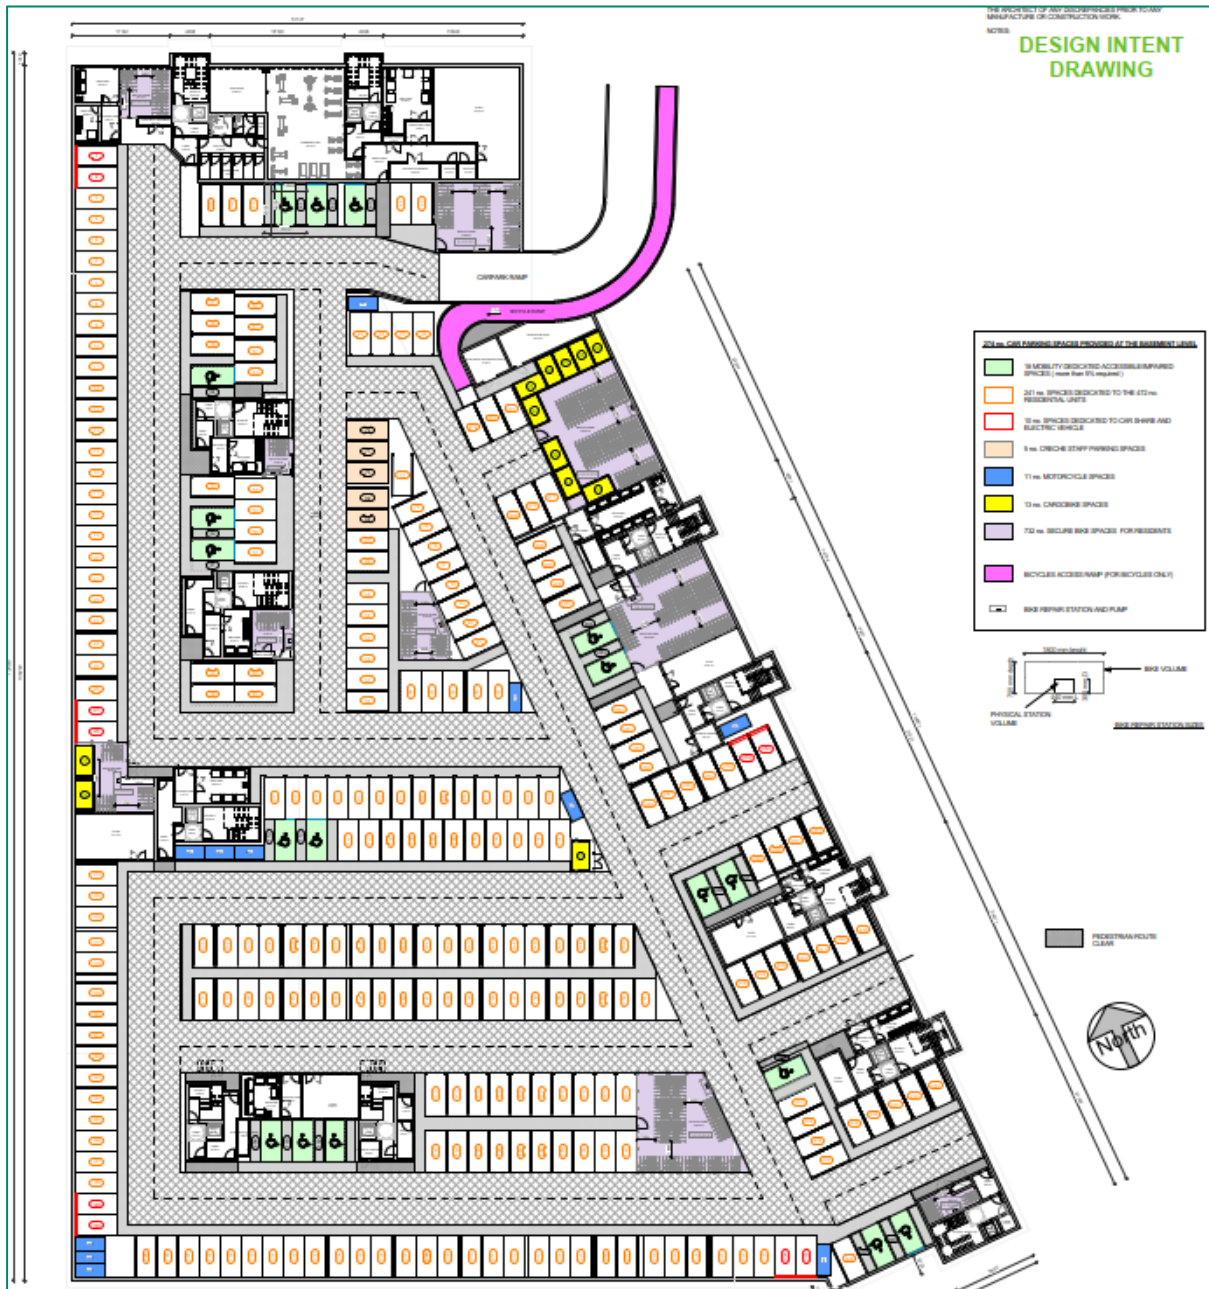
Basement Layout (Source: C+W O'Brien Architects Drawing No. 092035)
